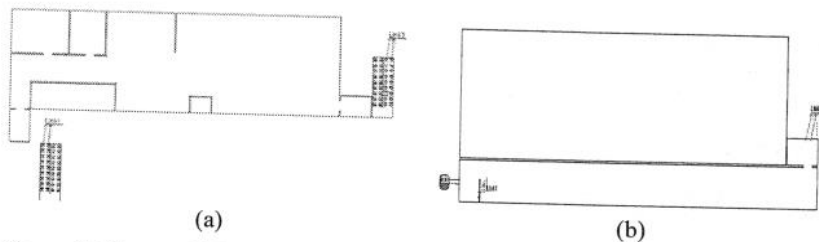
Geometric layout of the building as used in buildingEXODUS showing (a) first floor and (b) ground floor
